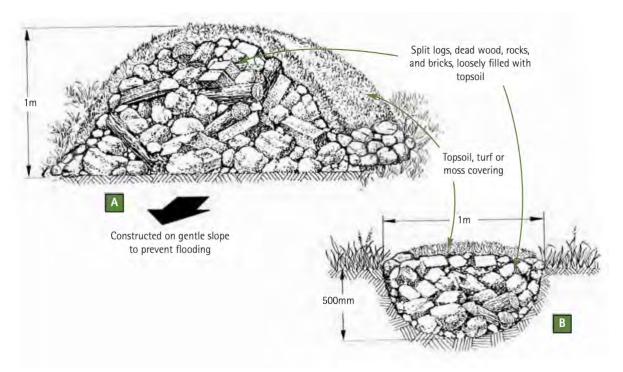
Example of a Great Crested Newt Refuge taken from the Great Crested Newt Conservation Handbook (Langton, Beckett and Foster, 2011).
